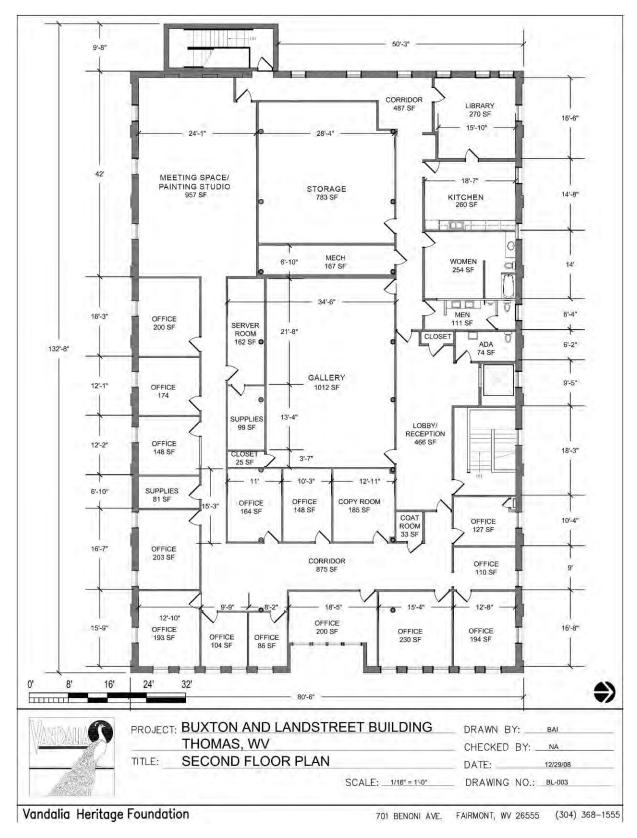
Buxton and Landstreet Company Store Floor Plan, Second Floor
